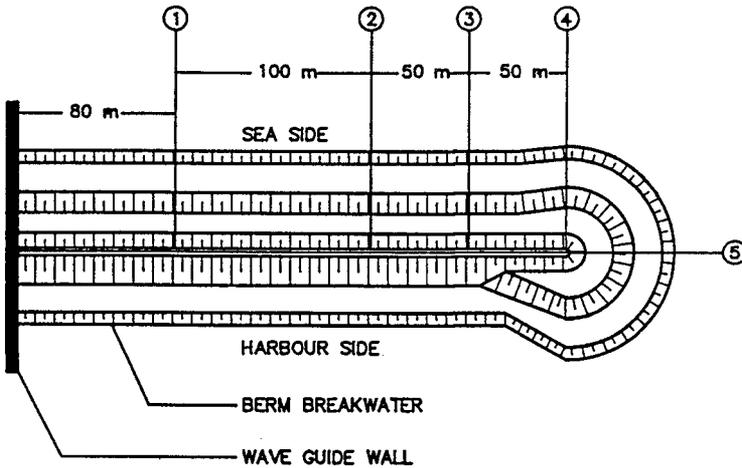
Queen's University Model Layout Profile Reshaping Measurement Lines
